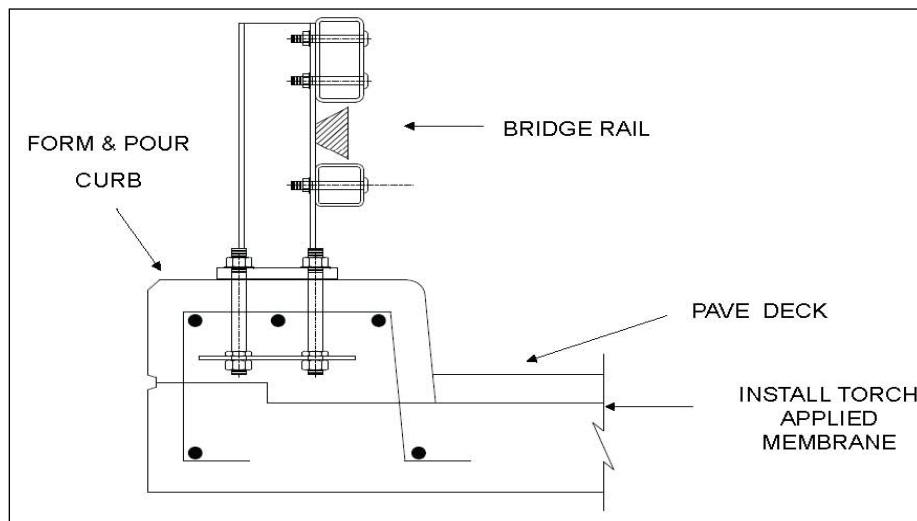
Conventional construction detail showing deck membrane and curb mounted rail system.
